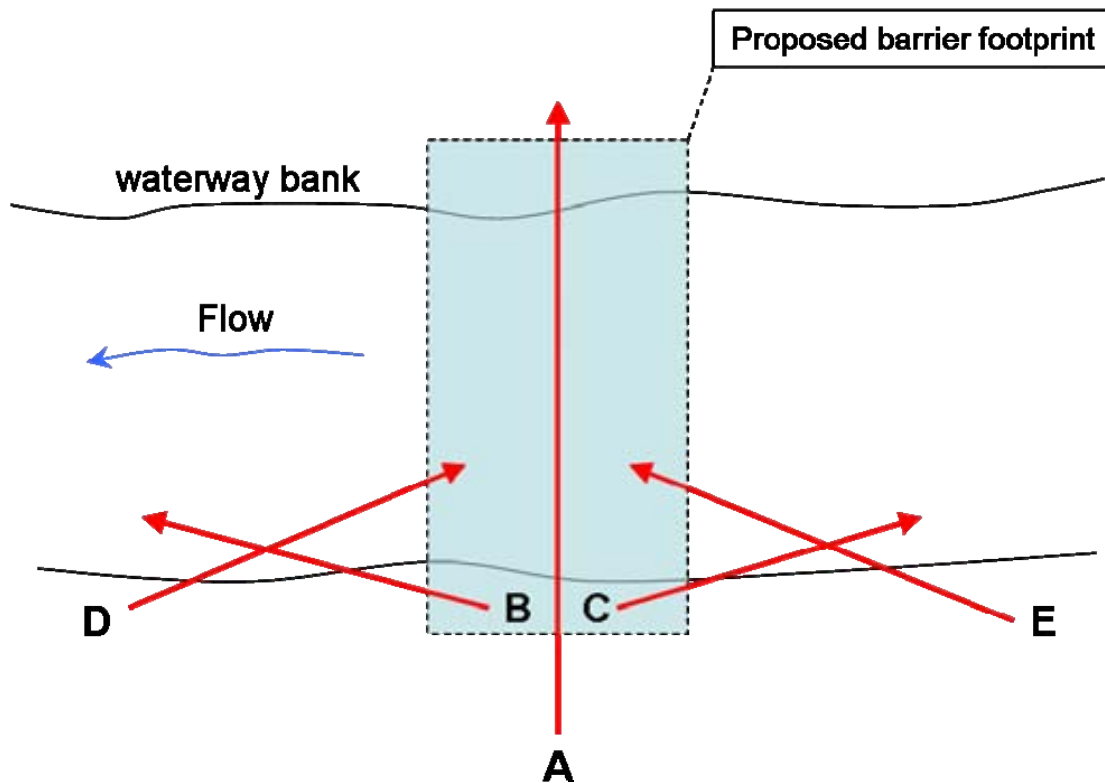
Generalised plan view of a site showing the location of photos to be taken for pre- and post-works notification
